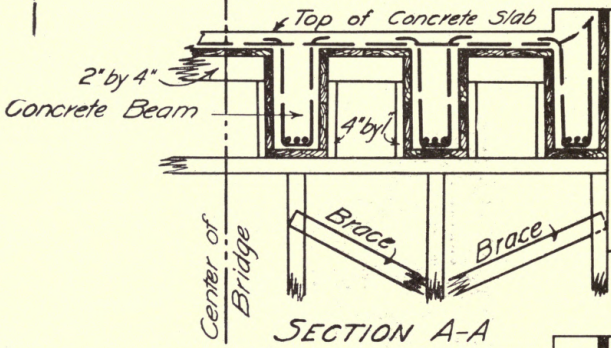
FORMS FOR SLAB AND BEAM BRIDGE.
